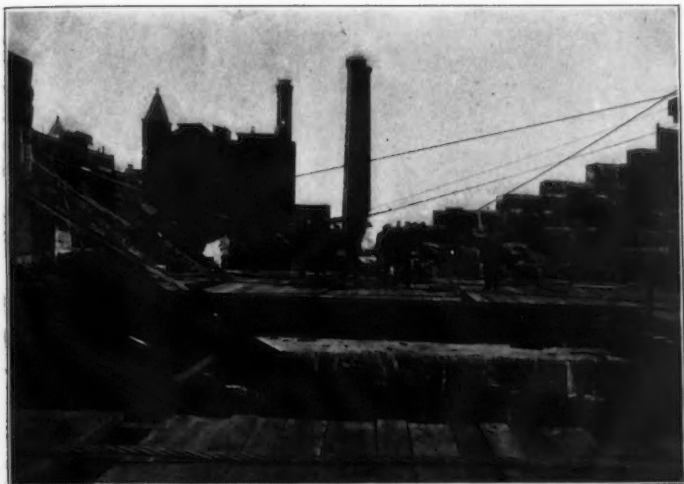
TAKING TENSION ON TACKLE FOR FINAL PULL ON FOOTBRIDGE CABLE.
